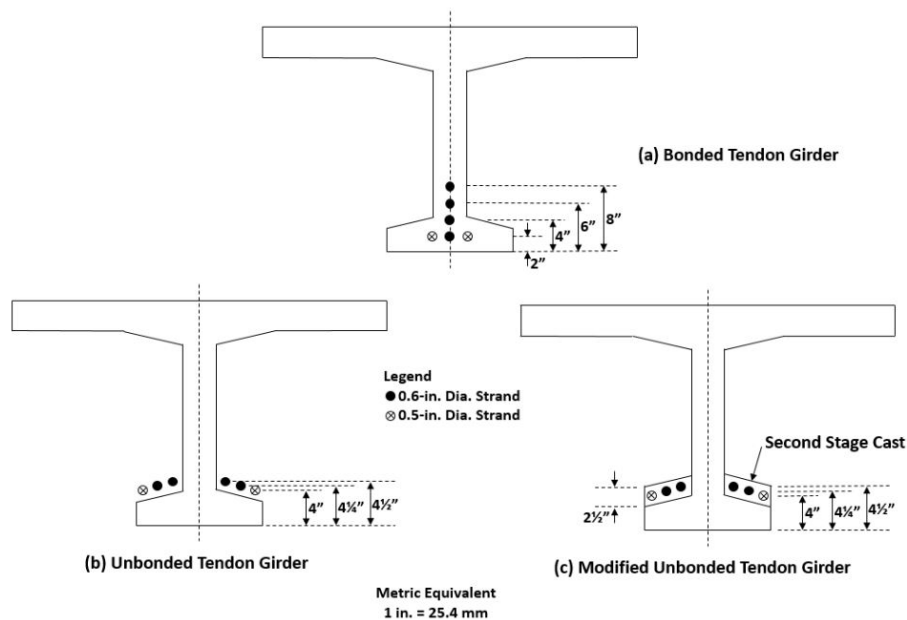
Typical Cross-section of Girders tested by Rabbat and Sowlat (1987)
